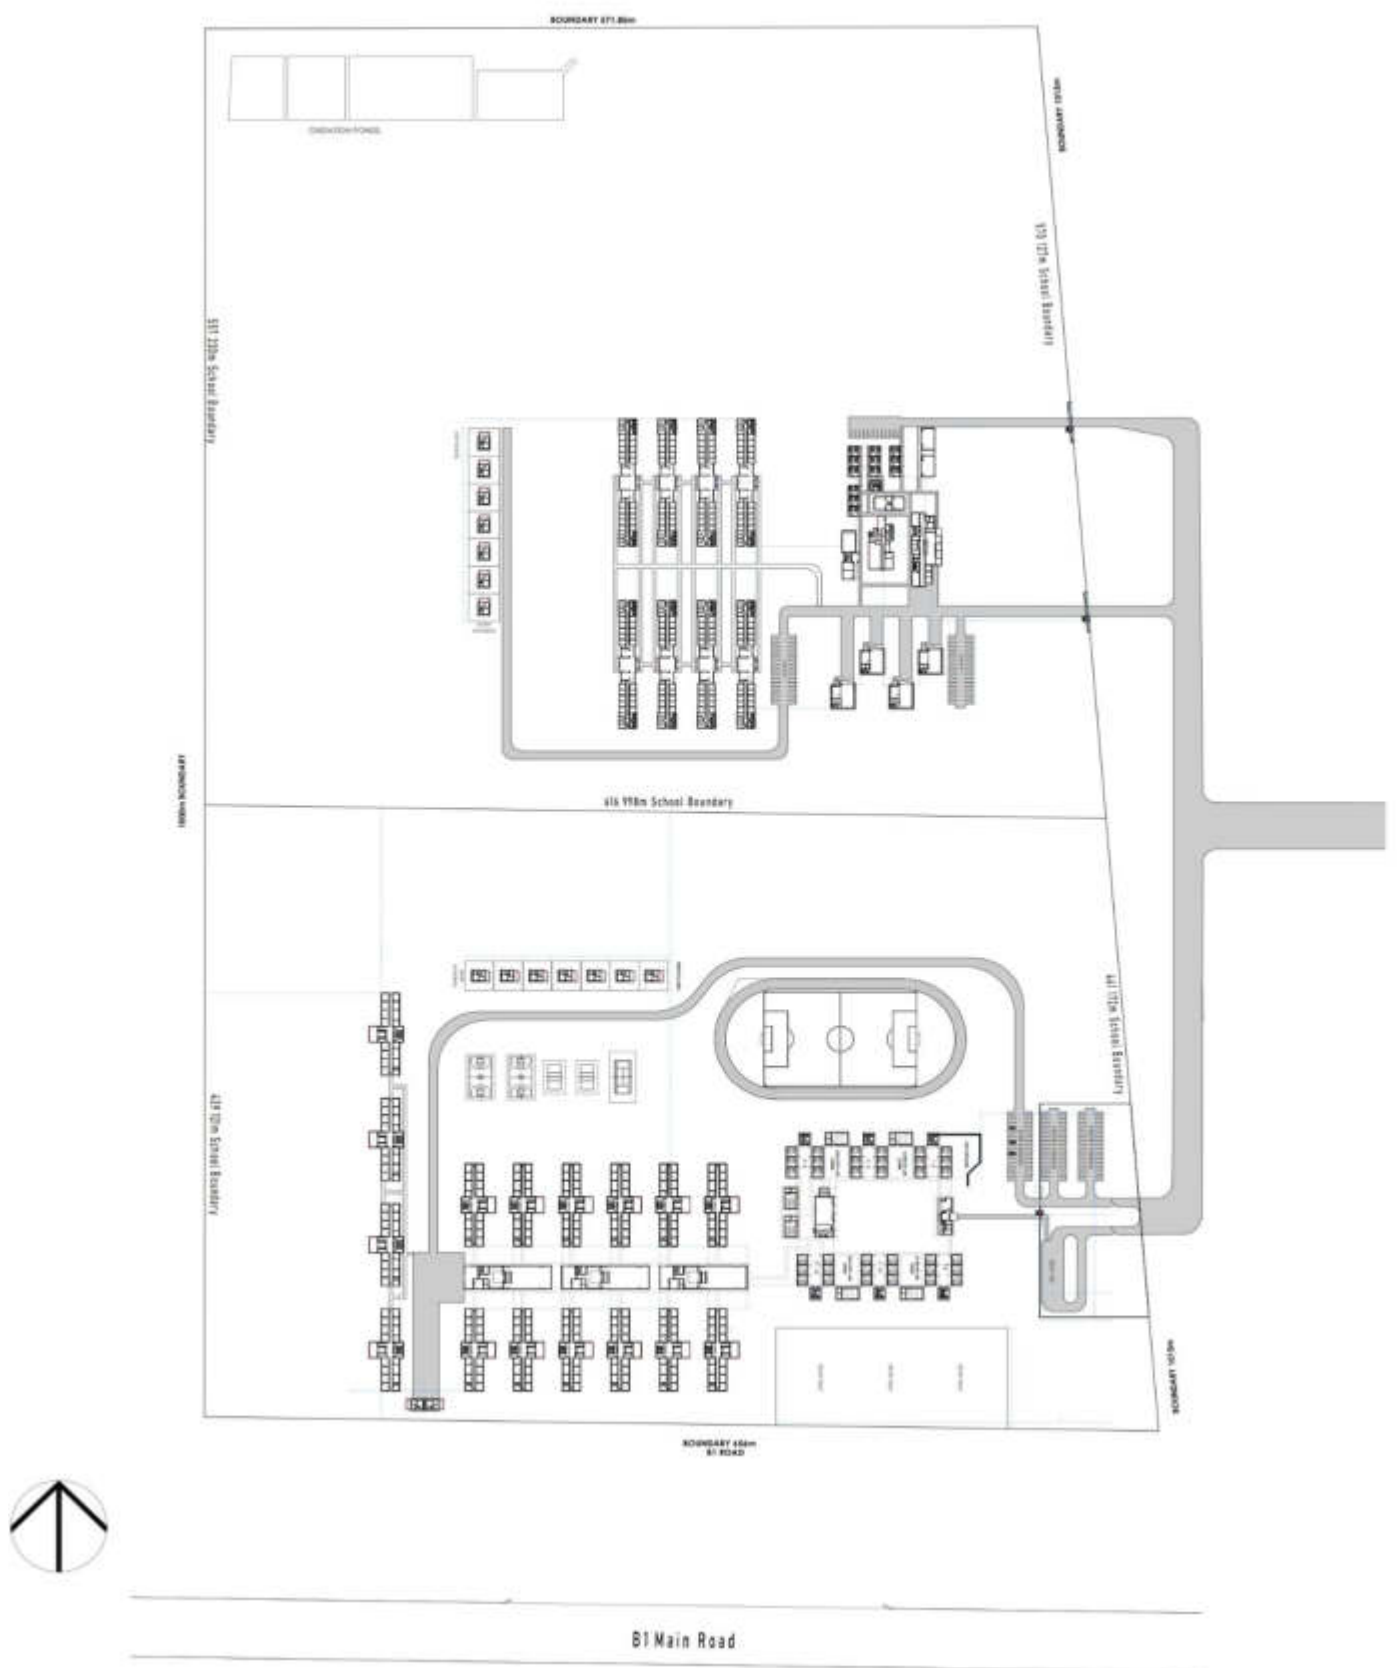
Site Plan of the proposed DR FAIPC (One Studio Architecture 2022)
